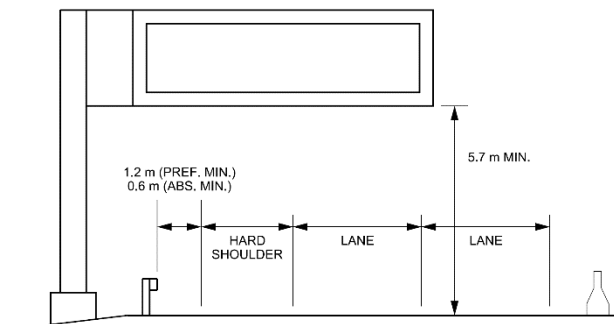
Section View of Typical Gantry-Mounted VMS (VMS on Cantilever Gantry)
